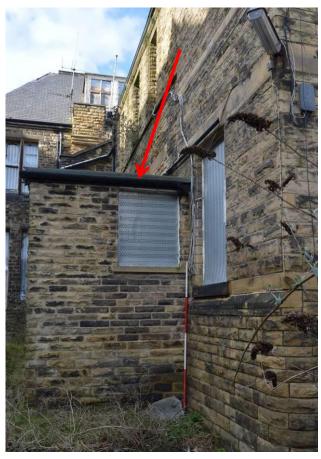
Flat roofed single storey extension to east of service wing. Scale 2m. Facing north west.
